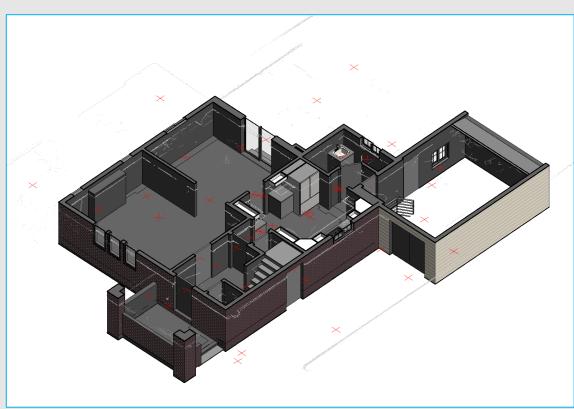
Premium Floor Plan Output as per 3D View in Revit
